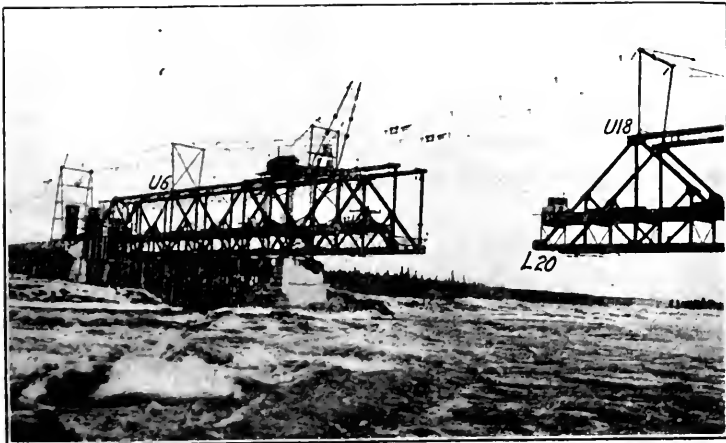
Northern anchor-span erected, also 100 feet of adjacent cantilever. Note additional rocker-bent at U6 for supporting cables.
